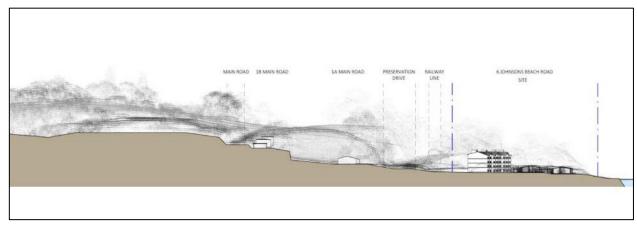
Section C - taken through the site and the south-eastern side of 1A and 1B Main Road.
